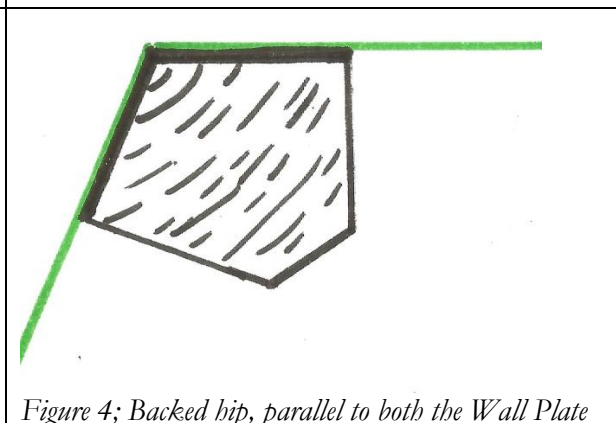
; Backed hip, parallel to both the Wall Plate and to the Tie Beam.
